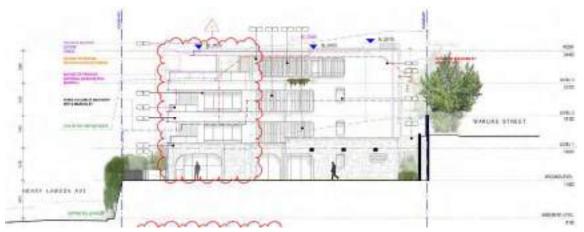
Extract of east elevation (from No. 3 Warung St) showing LEP 8.5m height line (Source: Squillace Architecture, Project No. HIG2307, Sept 2024)
